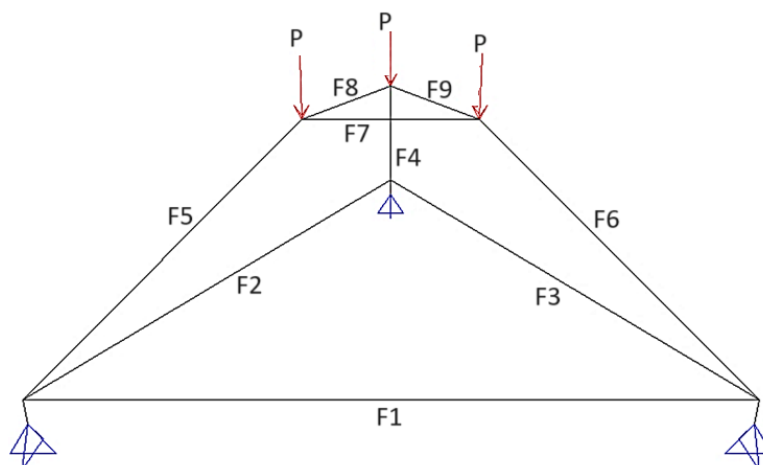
Modeling of Strut and Tie Shape on Foundation Cap
